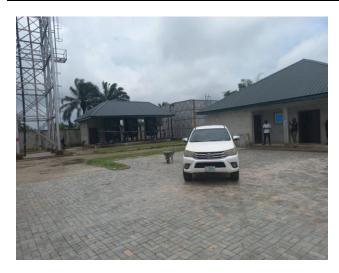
Landscaping completed at Lot 4, Barako Station.
